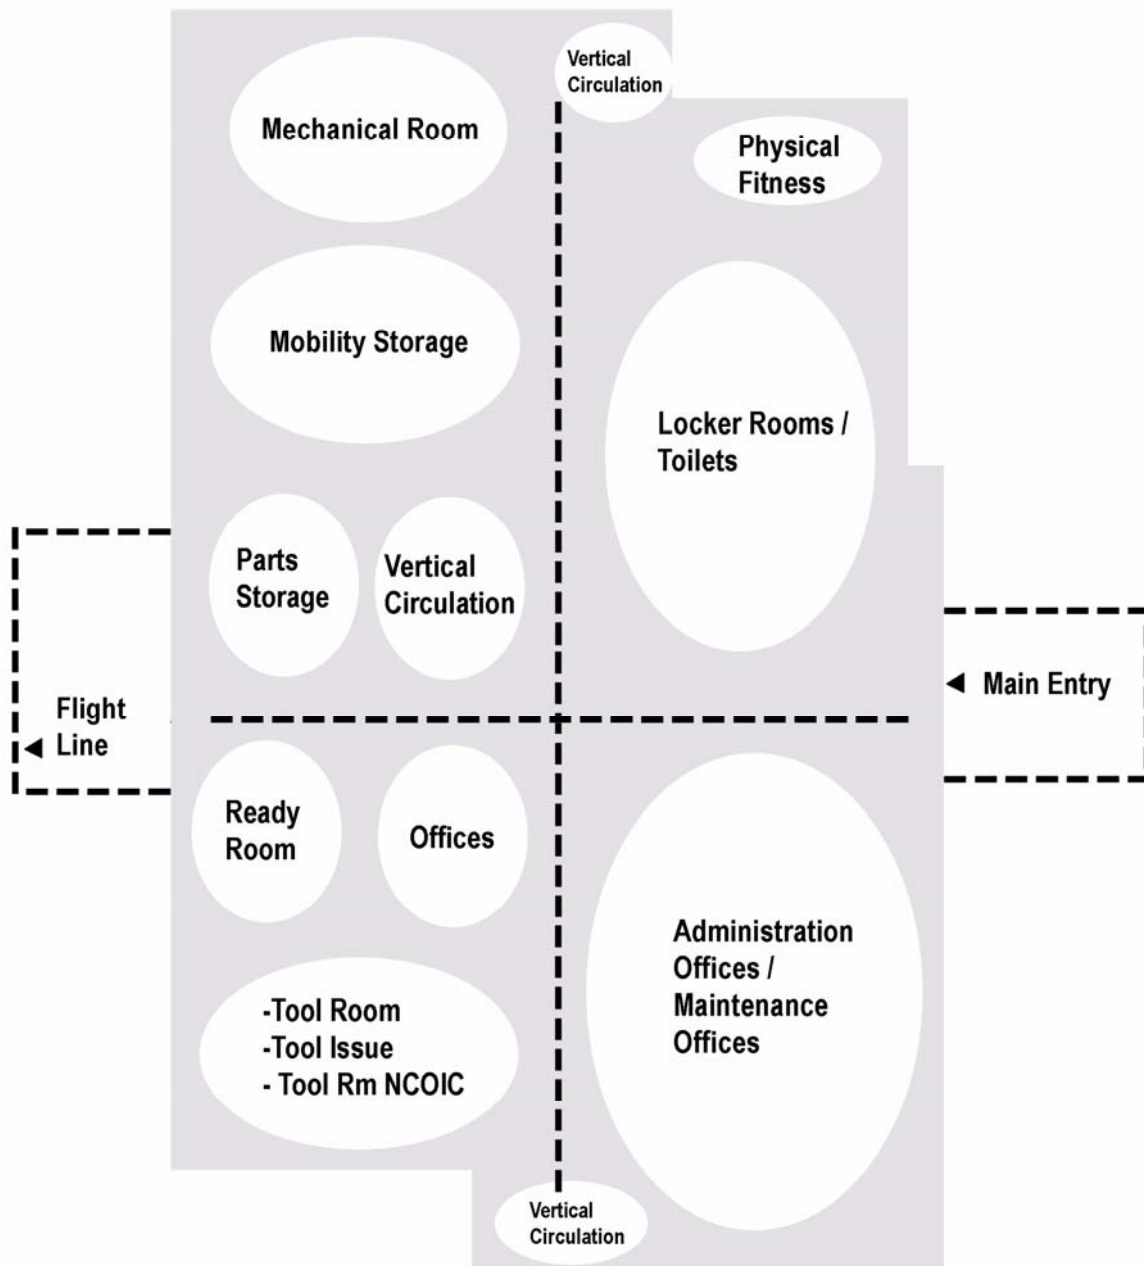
Concept Floor Plan C-5 and C-17 (First Floor)
